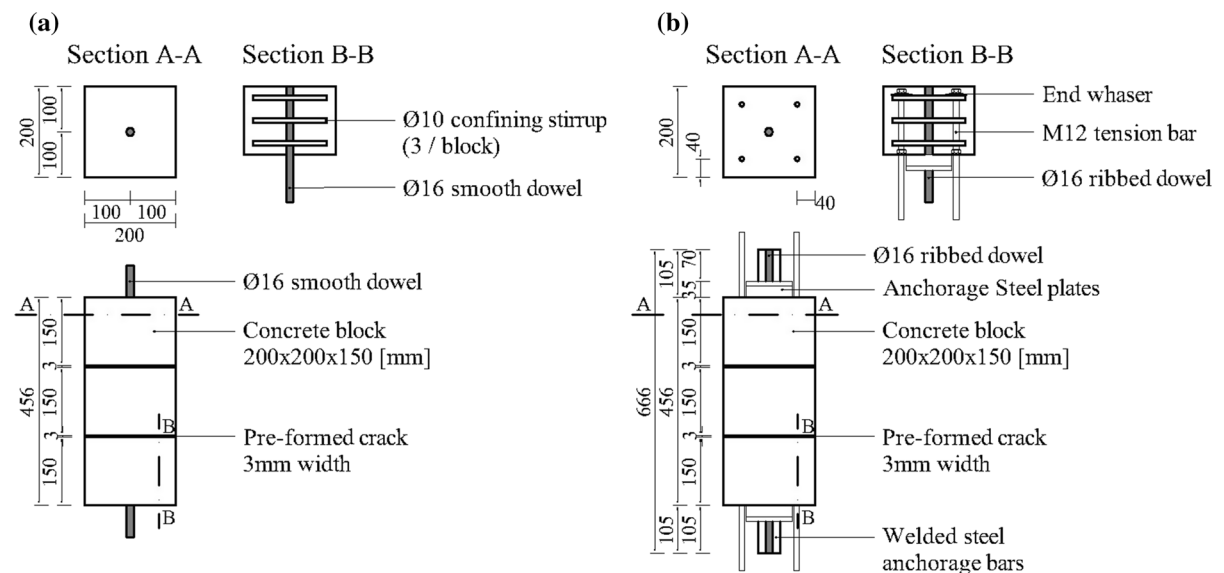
Geometry of the specimens and details about the end anchorage system for smooth (a) and ribbed (b) dowel specimens (dimensions in [mm])
